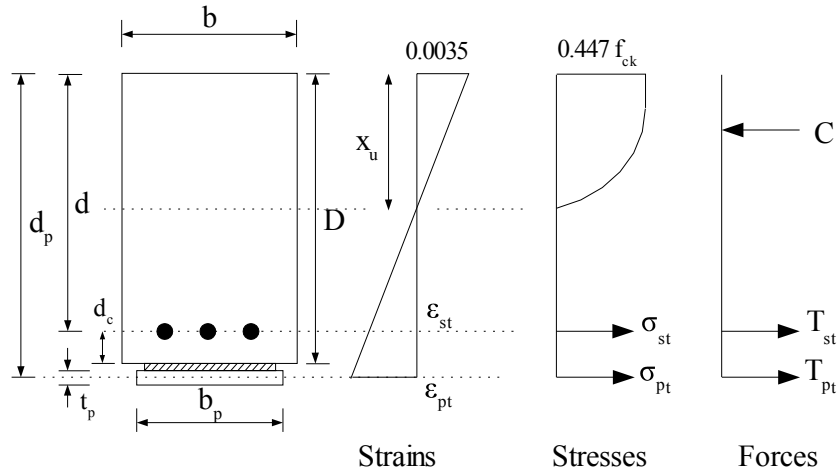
Strain and stress diagrams and internal forces of a tension-face plated beam
